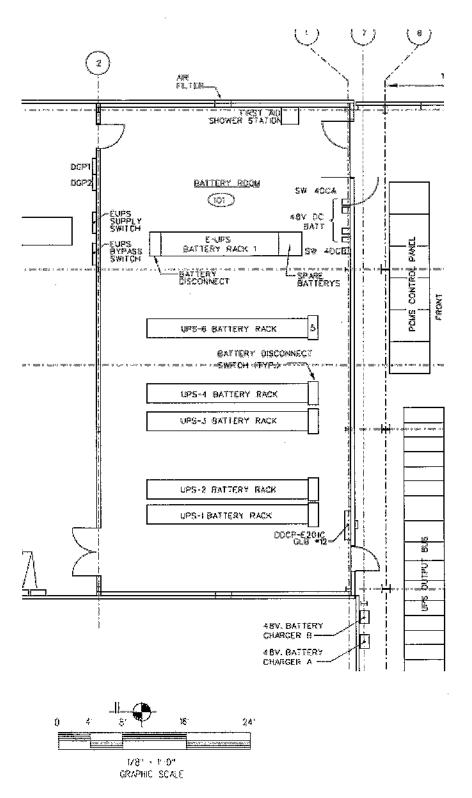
ACEPS Battery Room Generic Layout and Configuration.
